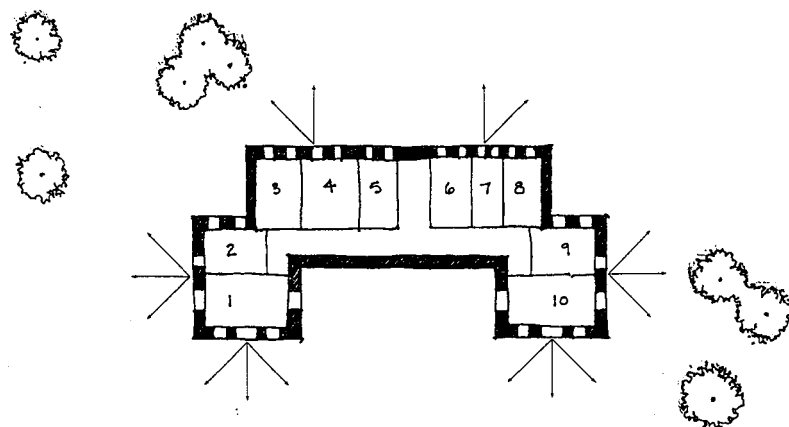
Plan View of an Apartment Building at Robert Taylor Homes With Nearby Trees
